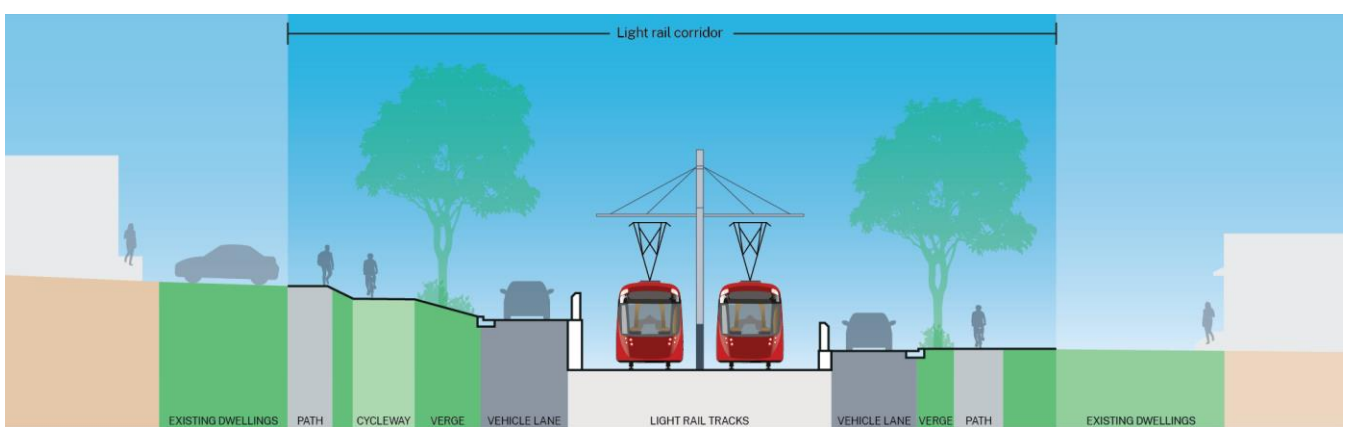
Indicative cross section showing retaining walls at Boronia Street
